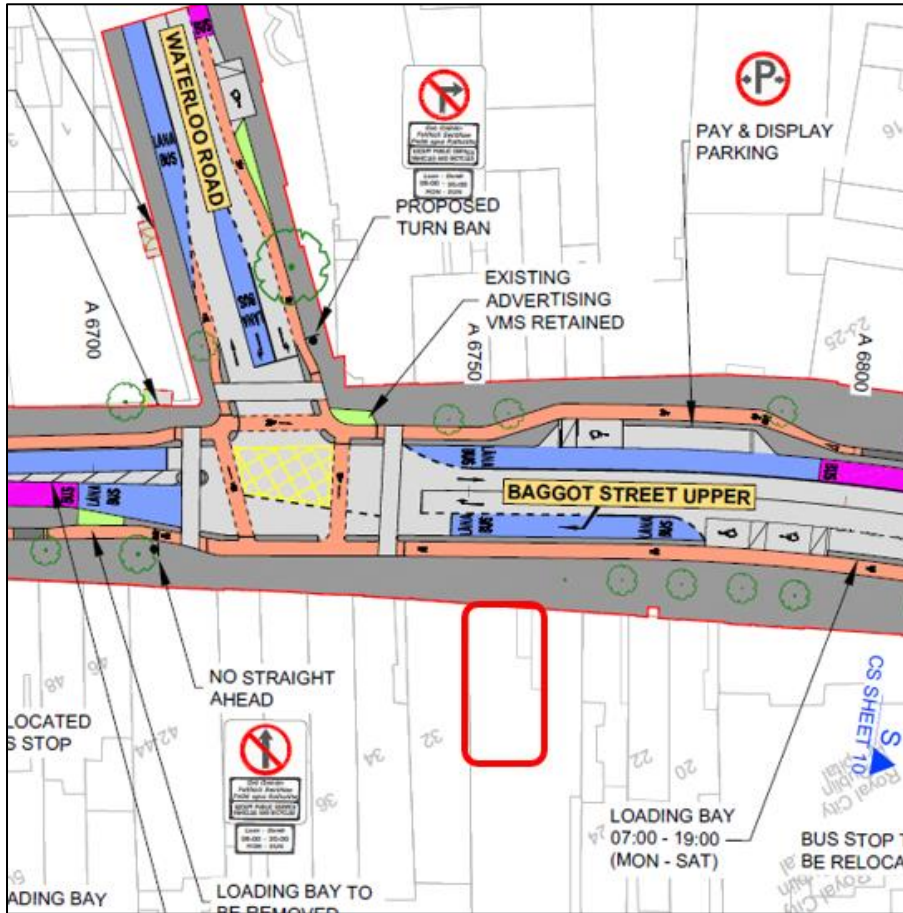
Proposed new Layout at Tesco Baggot Street Upper
